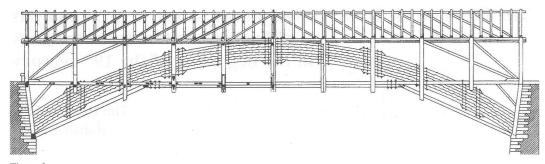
Grubenmann bridge at Wettingen, 1764–1766, free span about 62 m
